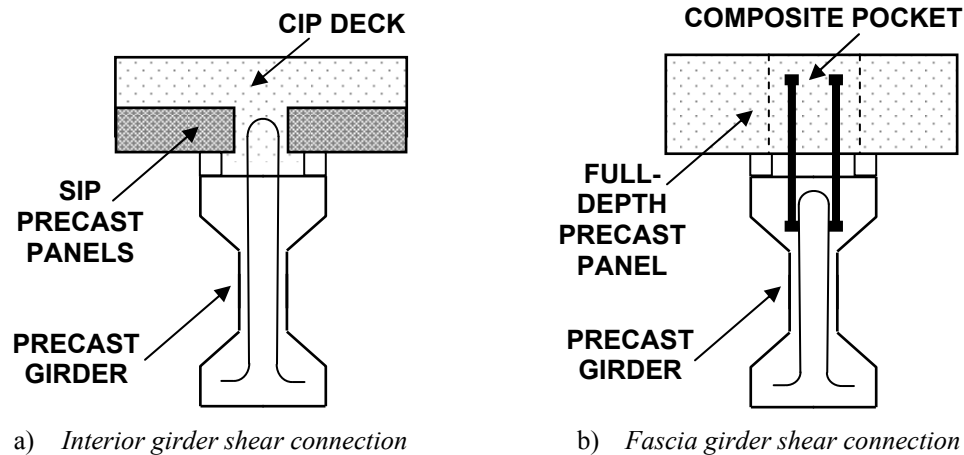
Shear connections used for full-depth overhang panel bridge deck
